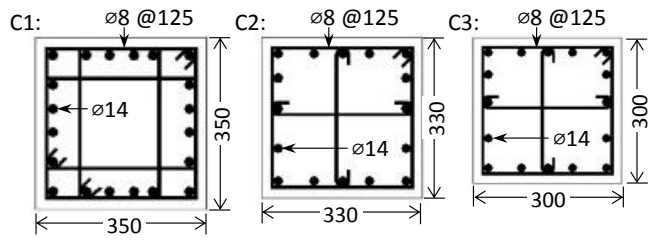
Column reinforcement details for 2-bay by 2-bay floor system (units in mm)
